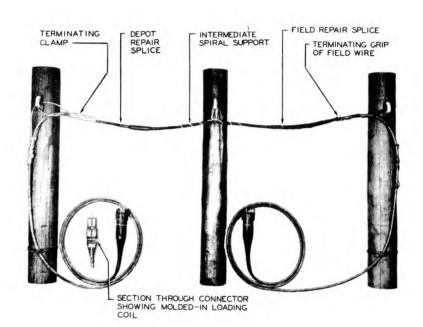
Cable Assembly CC-358 (Spiral-four Aerial Construction)
